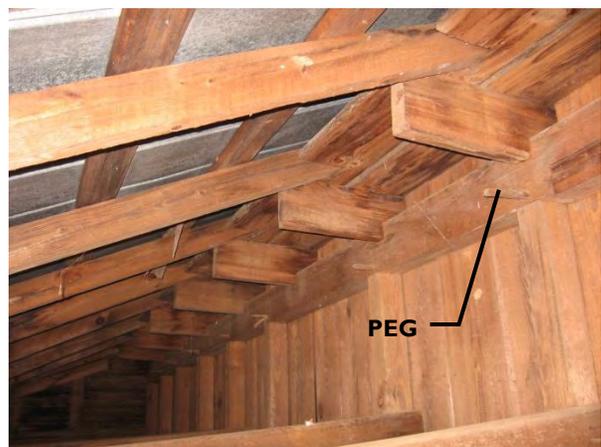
Tenant Cabin. View of wall framing from porch attic. Note projecting pegs at mortise-and-tenon connection of stud to plate.
